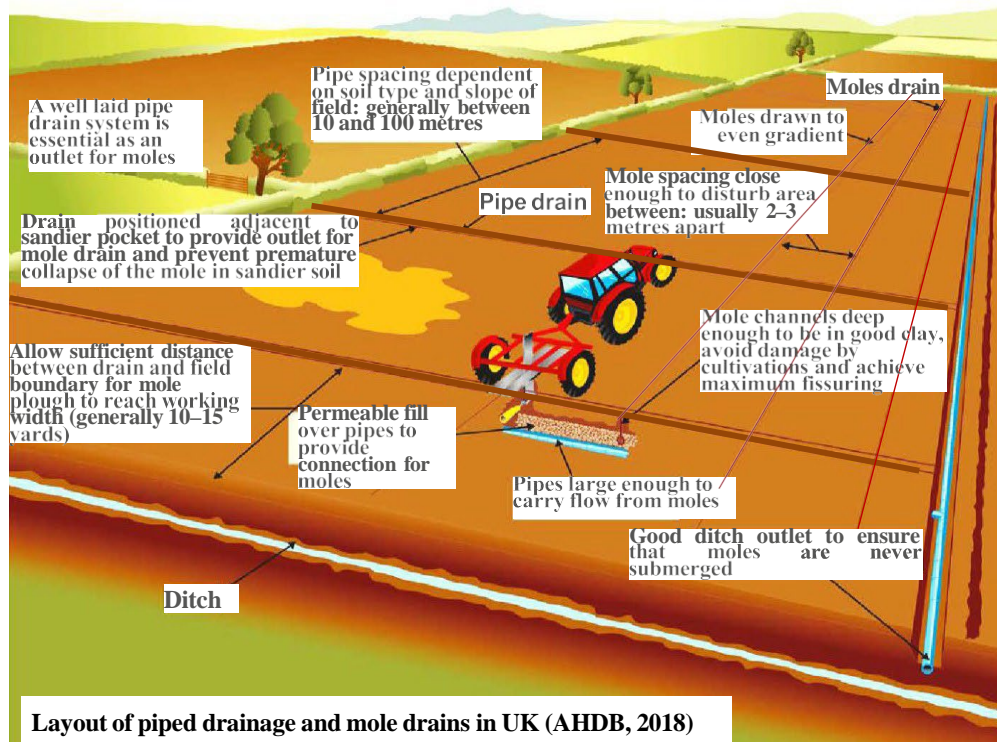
Current standard layout of piped and mole drains with ditch drainage platform in UK (AHDB 2018).
